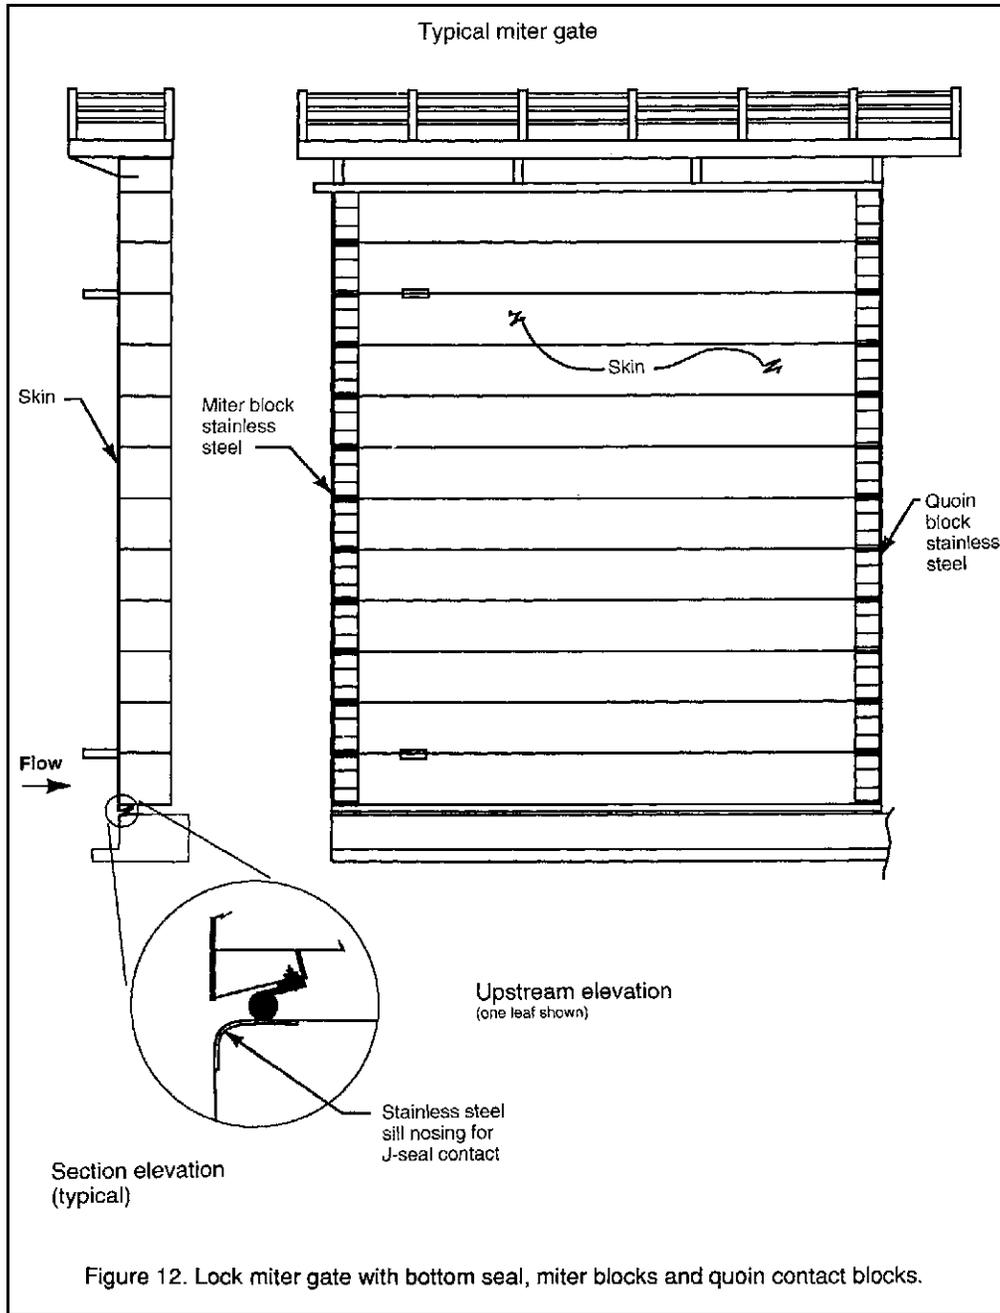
Lock miter gate with bottom seal, mitre blocks and quoin contact blocks
